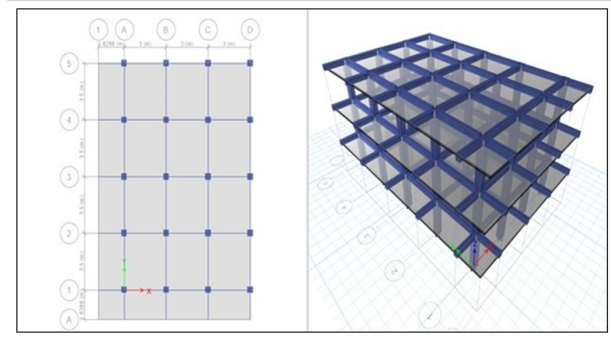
Plan and 3D of 3 story with two sides cantilever model
